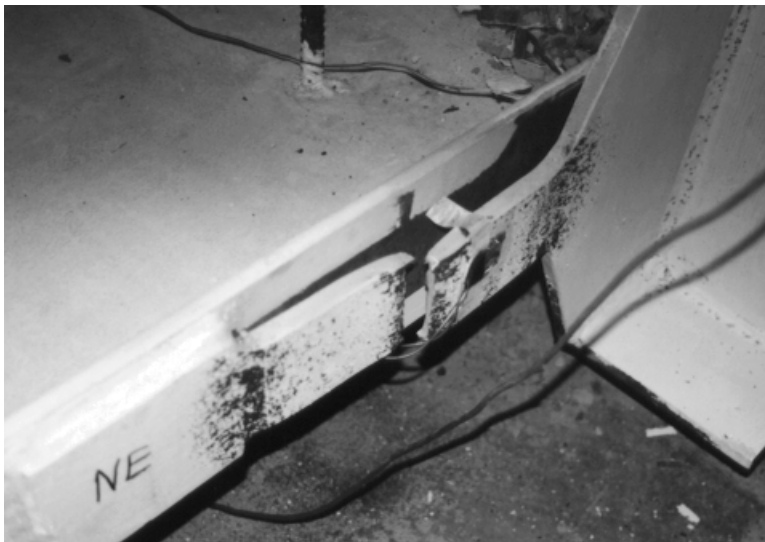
Testing of specimen with ductile steel fuse-plates: (a) Development of cracking contained by steel bands
